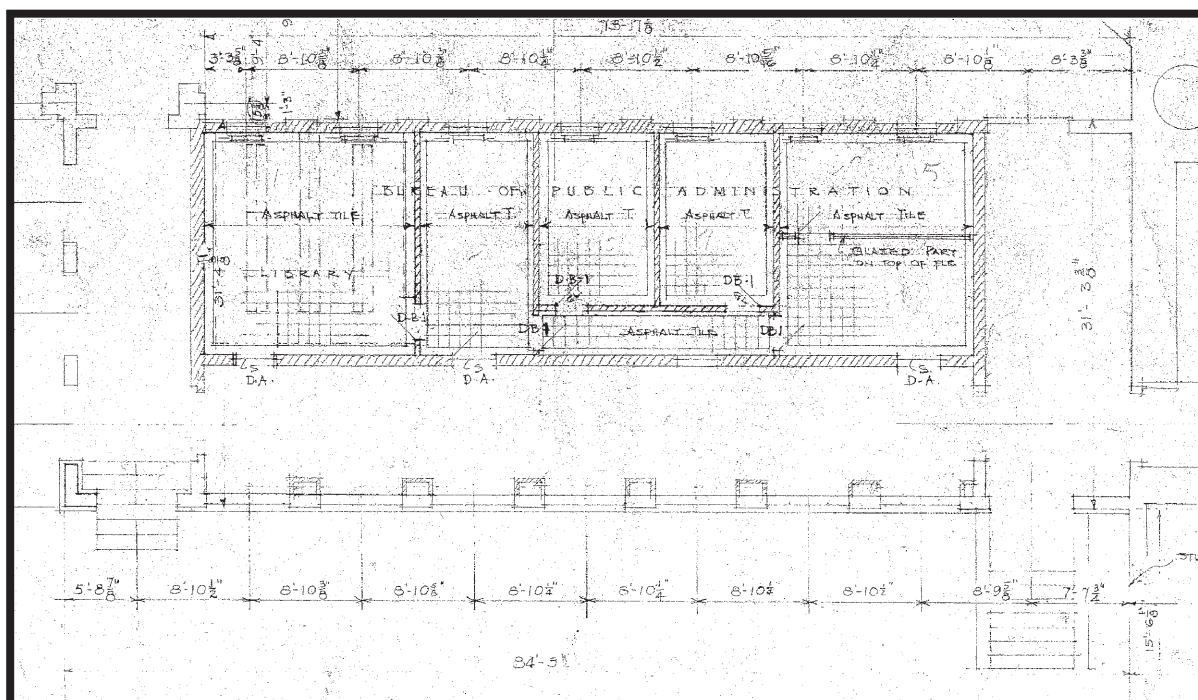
Stanislaw J. Makielski, detail of ground-floor plan showing the southwest wing.
